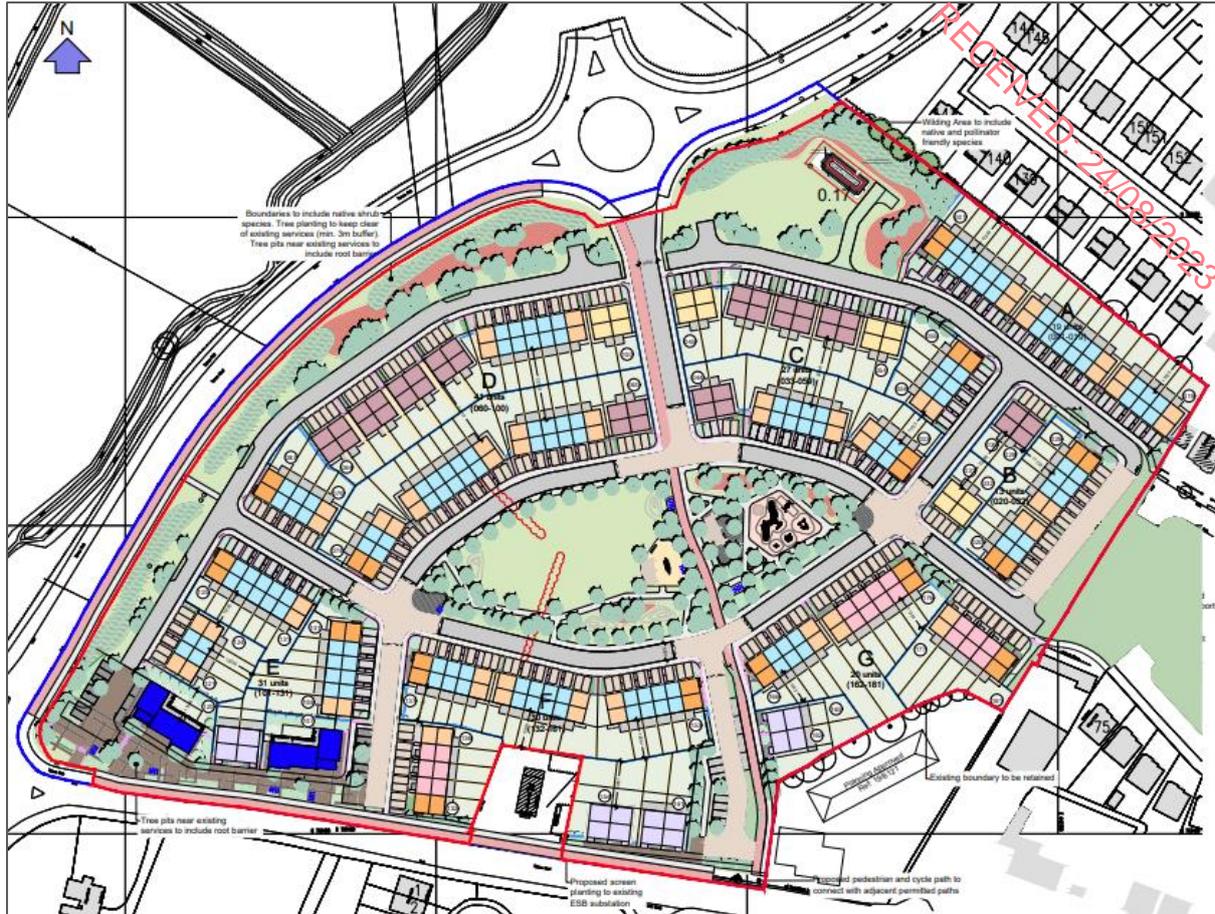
Alternative B: Layout submitted with LRD Section 247 Meeting Request to Westmeath County Council
